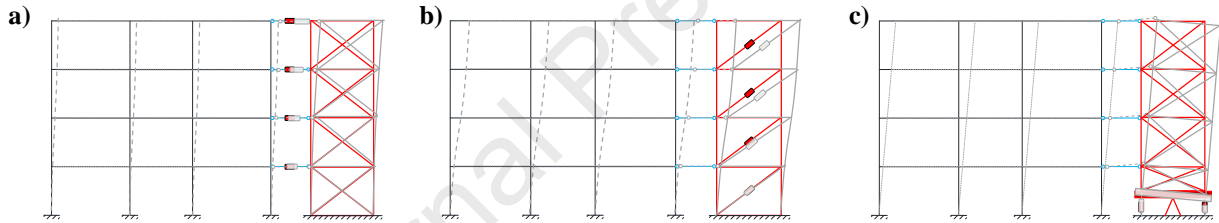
Illustration of three categories of external dissipative systems: (a) dampers placed horizontally at the storey level between the frame and an external stiff contrasting structure; (b) dampers incorporated within a new shear deformable structure; (c) pinned rocking bracing with dampers located at the base.
